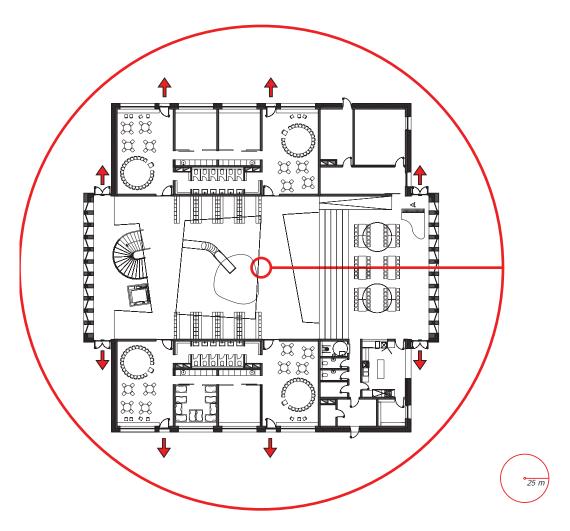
FIRE EMERGENCY EXITS ON GROUND FLOOR.
